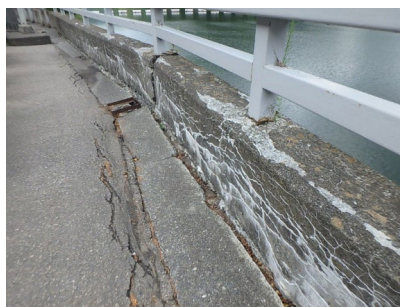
Cracked parapet concrete placed around a dam lake (No. 2), with mortar cover scaling.
